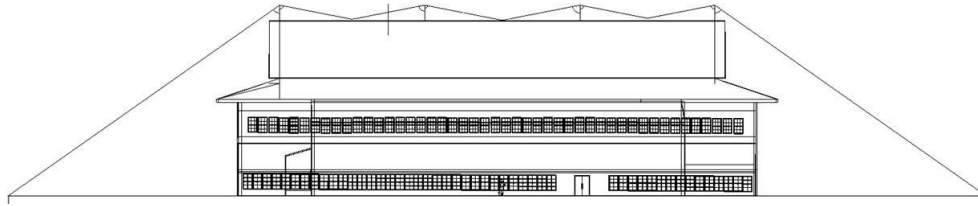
Protection Angle of Building B12 Electrical Engineering FT UM (front view)
